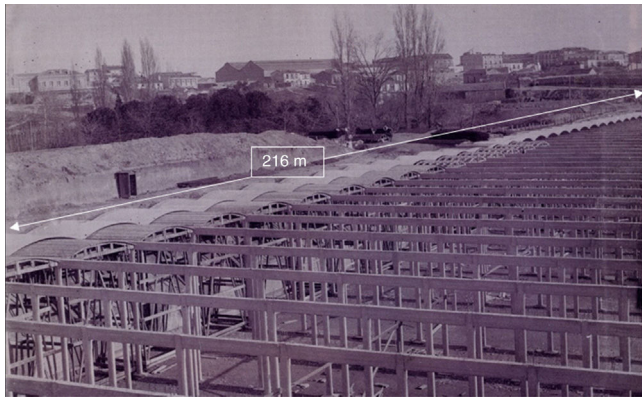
Construction of the Third Reservoir of Canal de Isabel II. Madrid, 1905.
